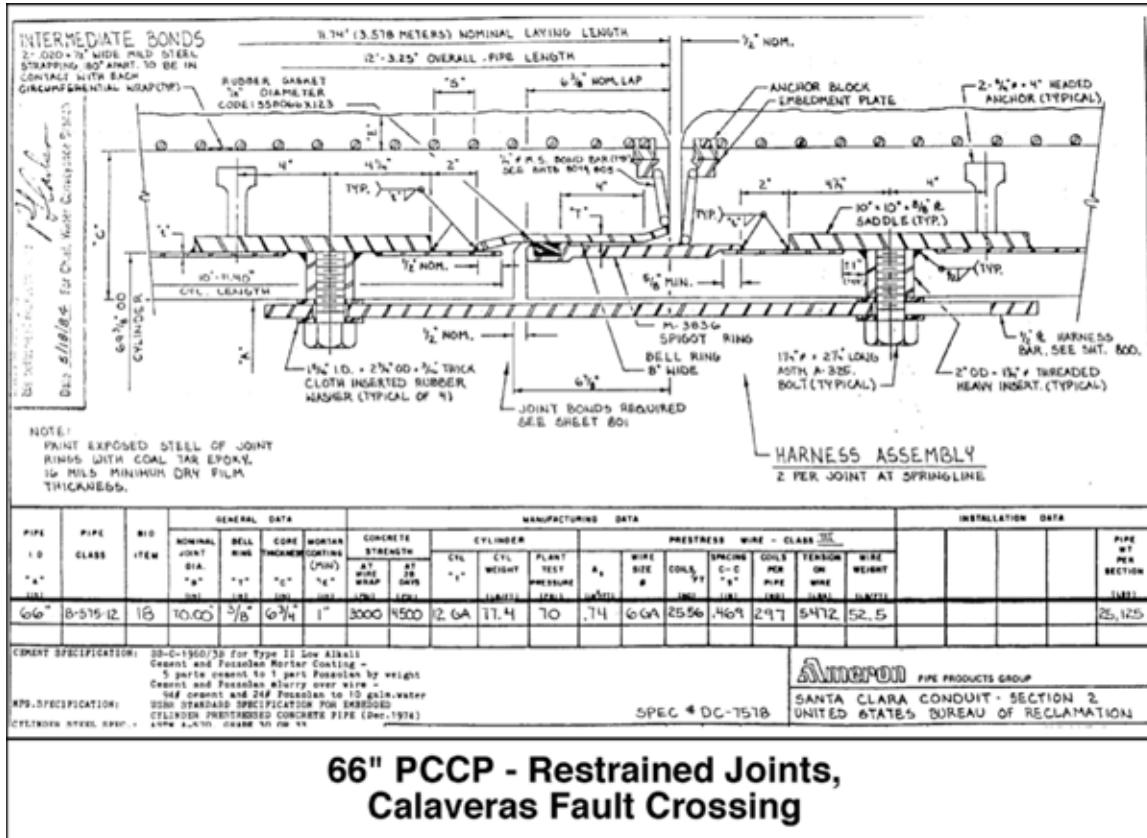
Example of a PCCP Pipe Joint using 6-inch Long Restrained Segmented Joints
